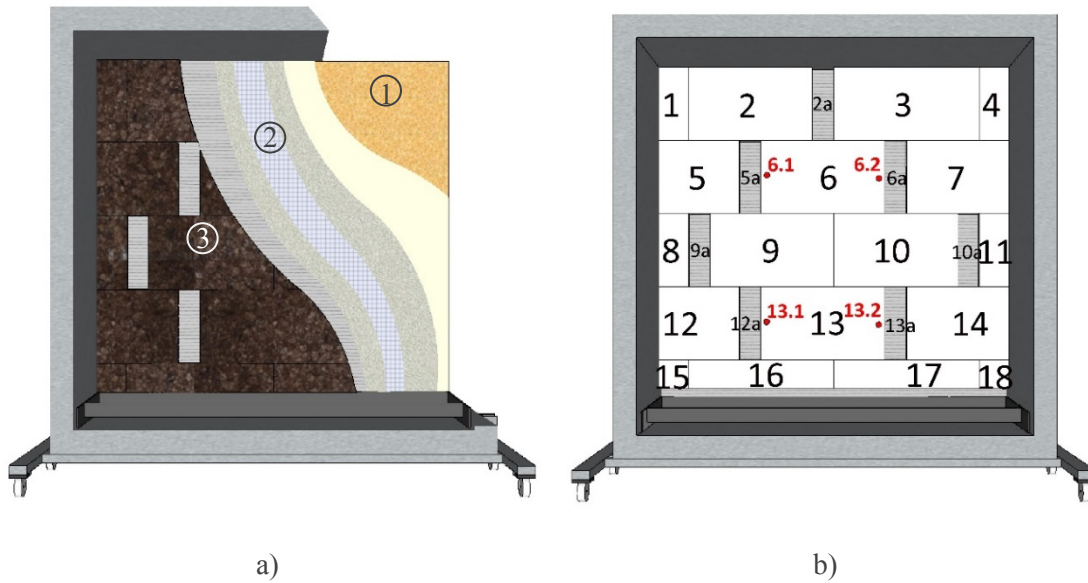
Wall test specimen: a) Composition: 1- OSB; 2- waterproofing and bonding mortar; 3- medium density expanded cork board); b) Numbering of the expanded cork board panels and of the sub-blocks; Measuring points.
